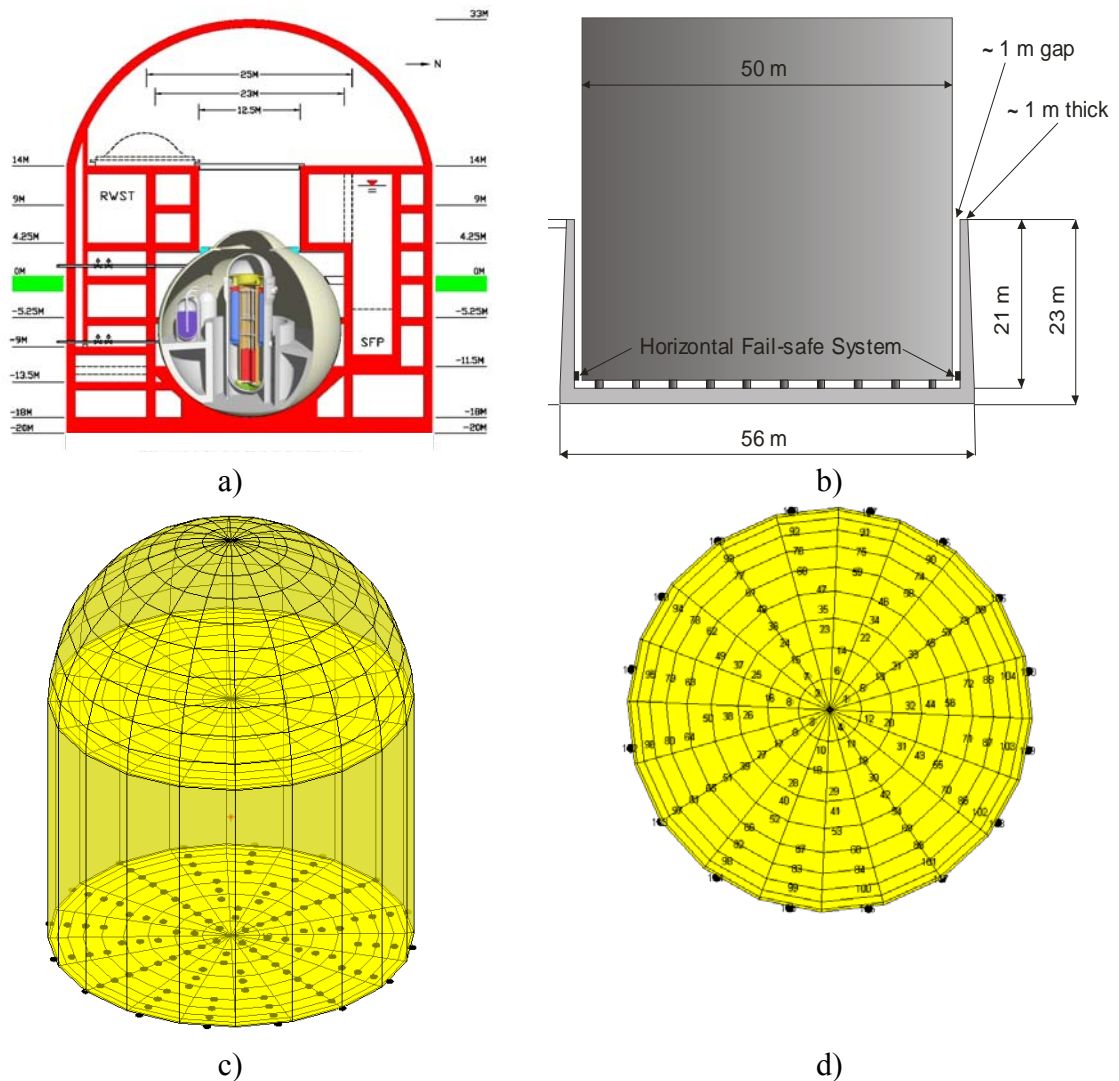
IRIS NSSS building (a); isolation system (b); isolators layout (c-d)
